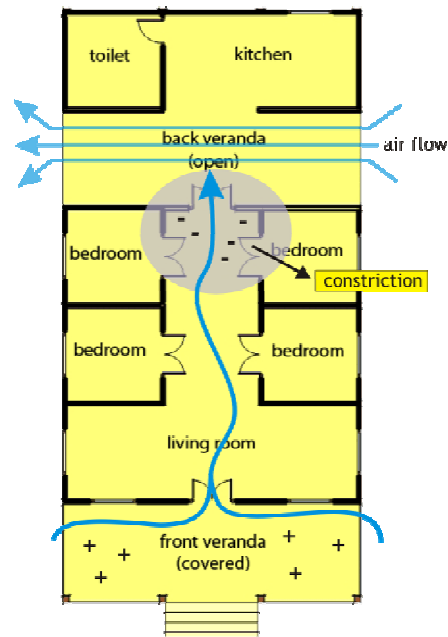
The back veranda acts as venturi tube and main building opening acts as the constriction, which will allow indoor air flows and give accepted natural ventilation for the house.
